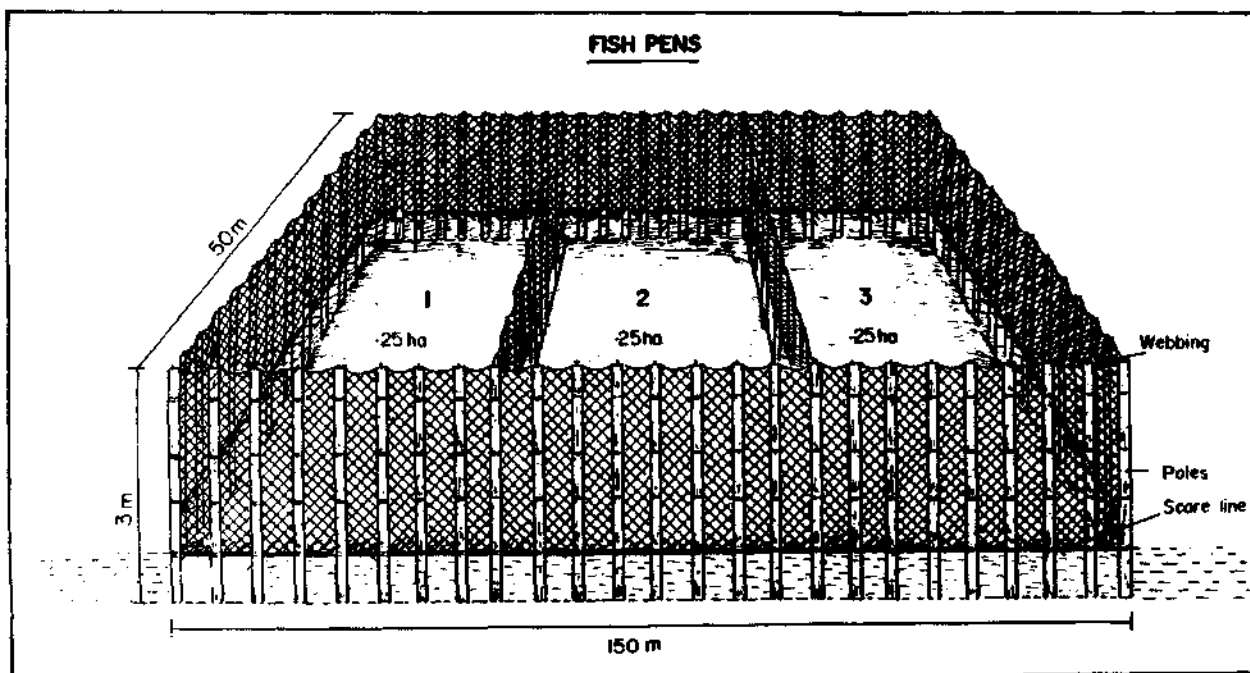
Three fish pens constructed in Pillaimadam lagoon
